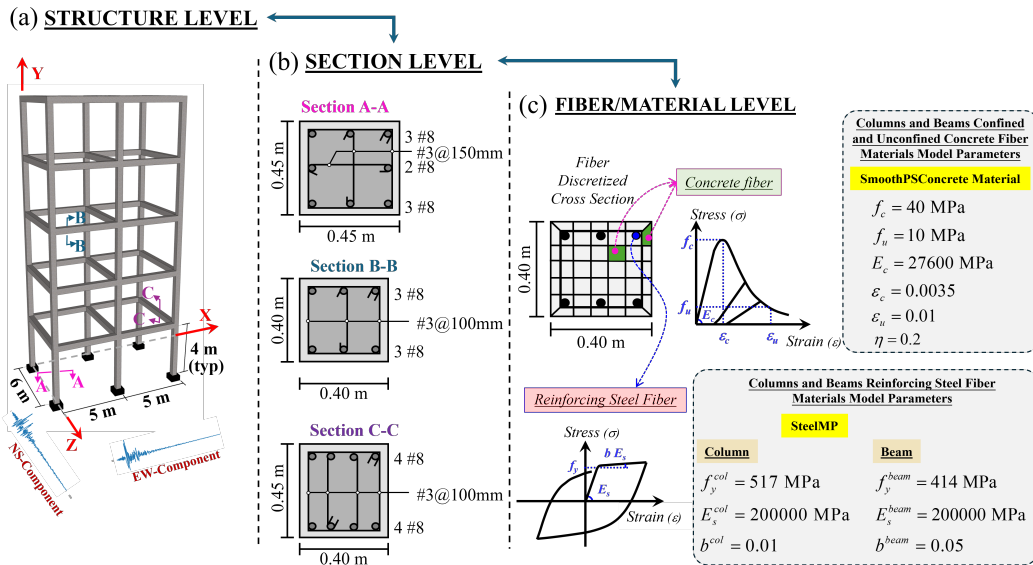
3D RC frame building: (a) structure level overview, (b) cross-sections of beams and columns, (c) fiber or material level (material model parameters).
